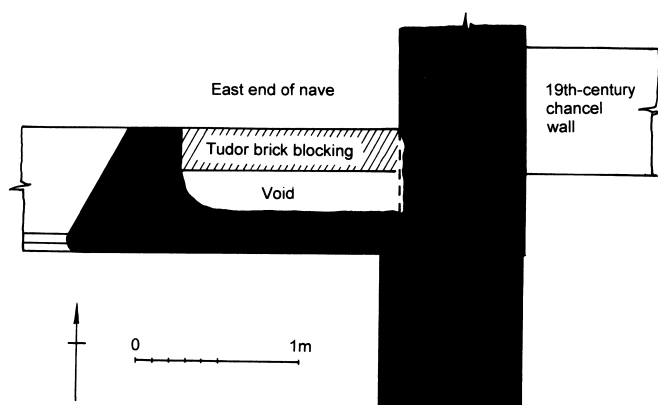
Abberton St. Andrew, plan showing void found at the east end of the south wall of the nave
